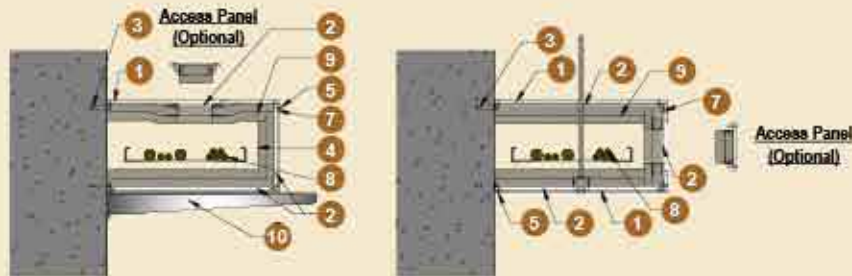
THREE-SIDED CONSTRUCTION FROM SIDE WALL
